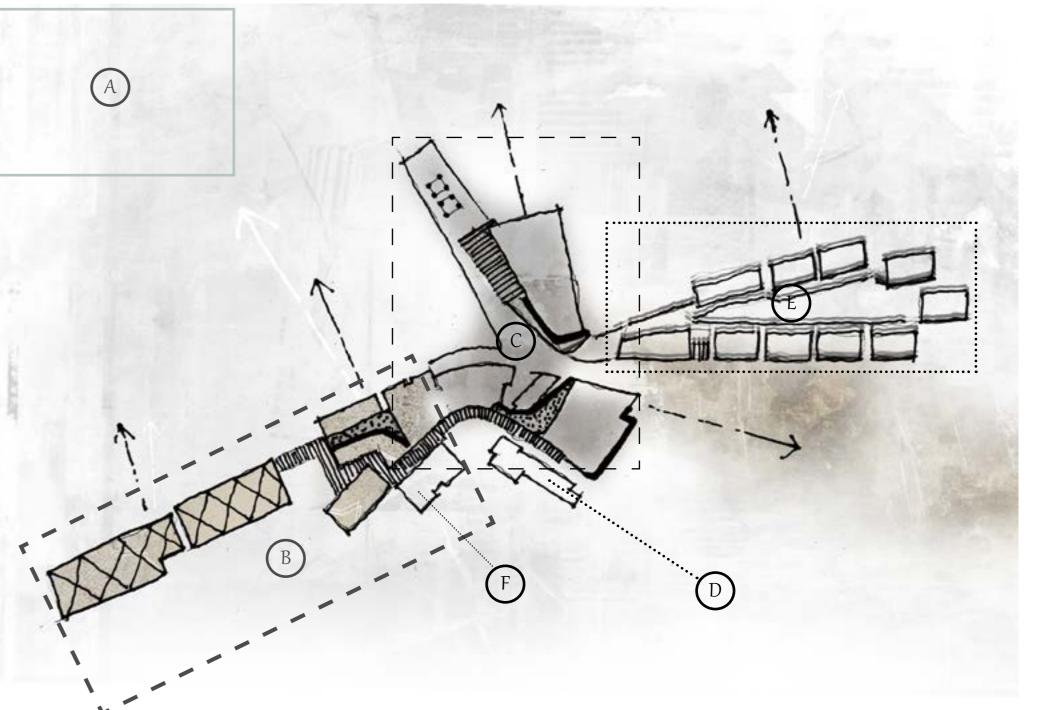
Floor plan divided into parts (Author, 2021)
